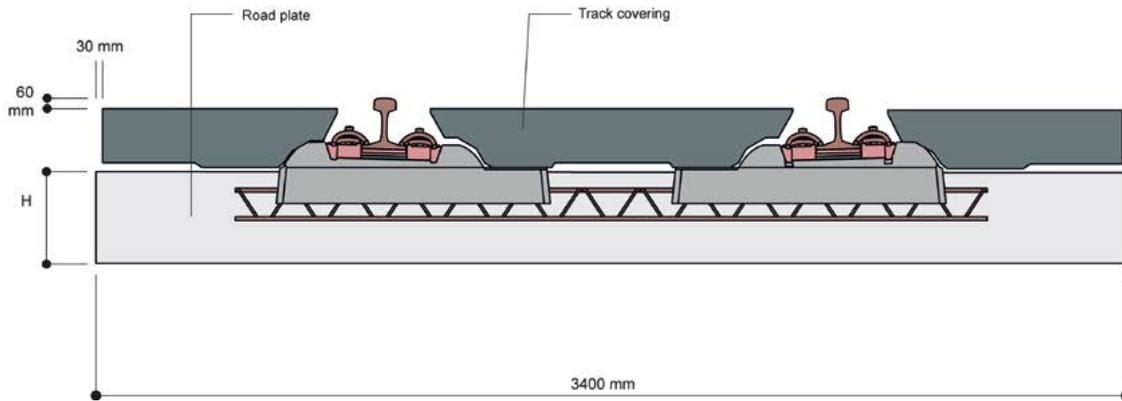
Tunnel transverse profile with rescue system ROSS on RHEDA 2000®
